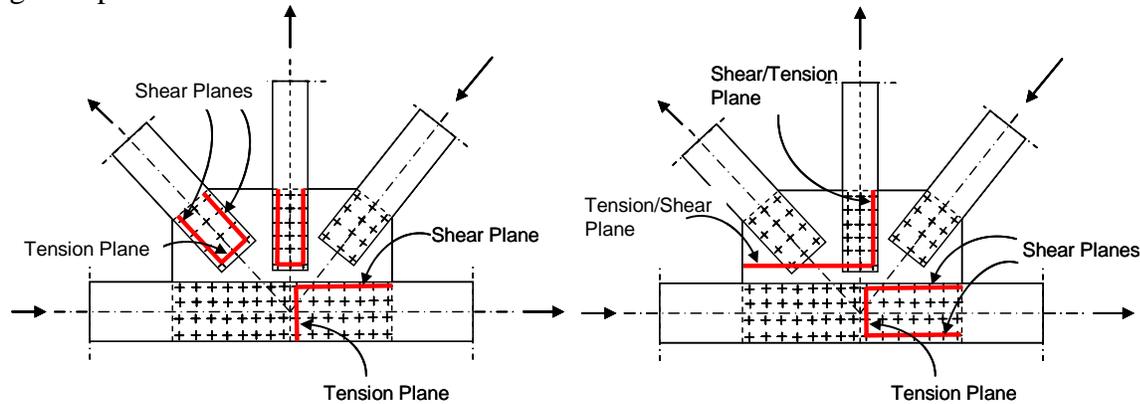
Examples of block shear rupture planes in gusset plates in tension
